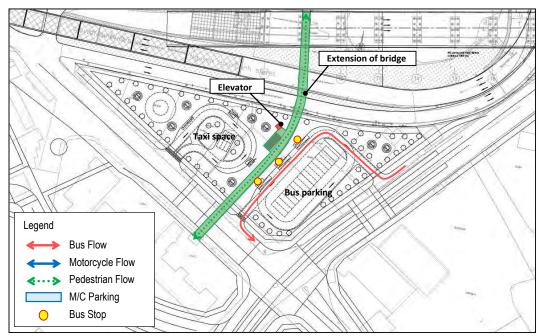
South Station Plaza at Tan Cang Station (in the future)
